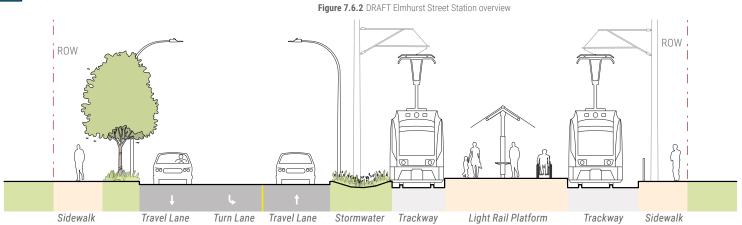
DRAFT Elmhurst Street Station Cross Section
